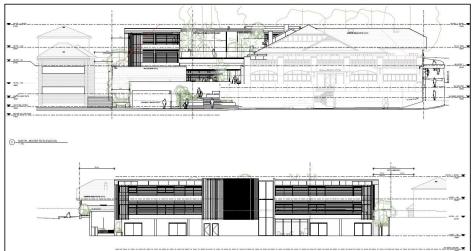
Excerpt from architectural plans; Indicative north and south elevations.
